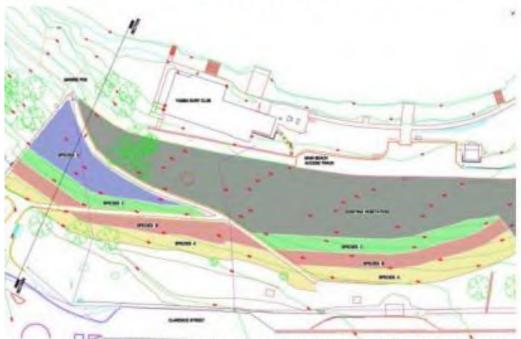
Proposed landscape plan - manicured horticulture placement slope treatment – Flinders Park
